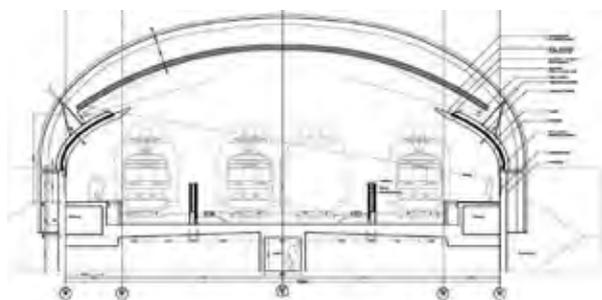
Cross-section of the underground station (Ill. Norwegian National Rail Administration)
